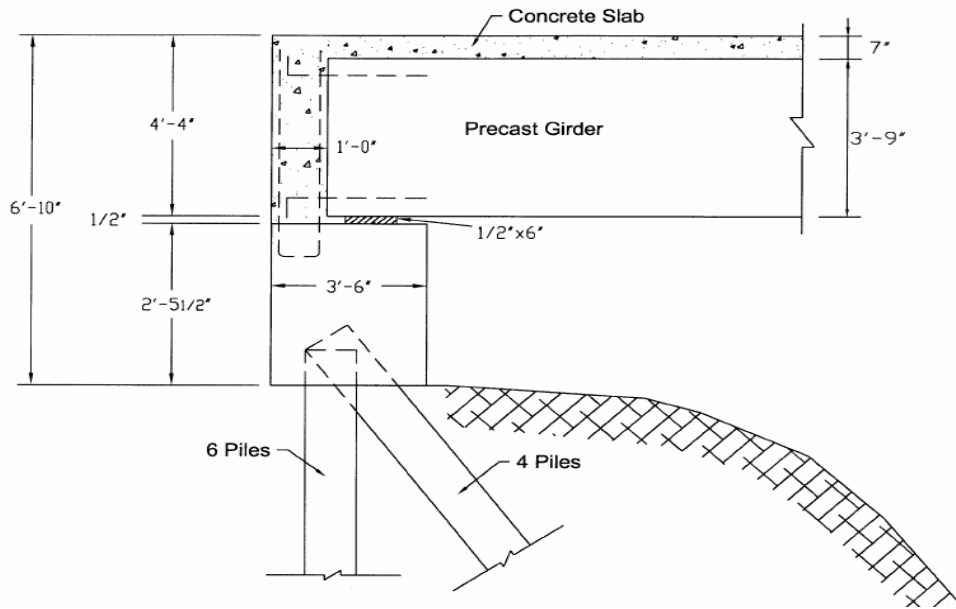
Bridge abutment supported by 10 piles, one back wall, and 2 side wing walls
